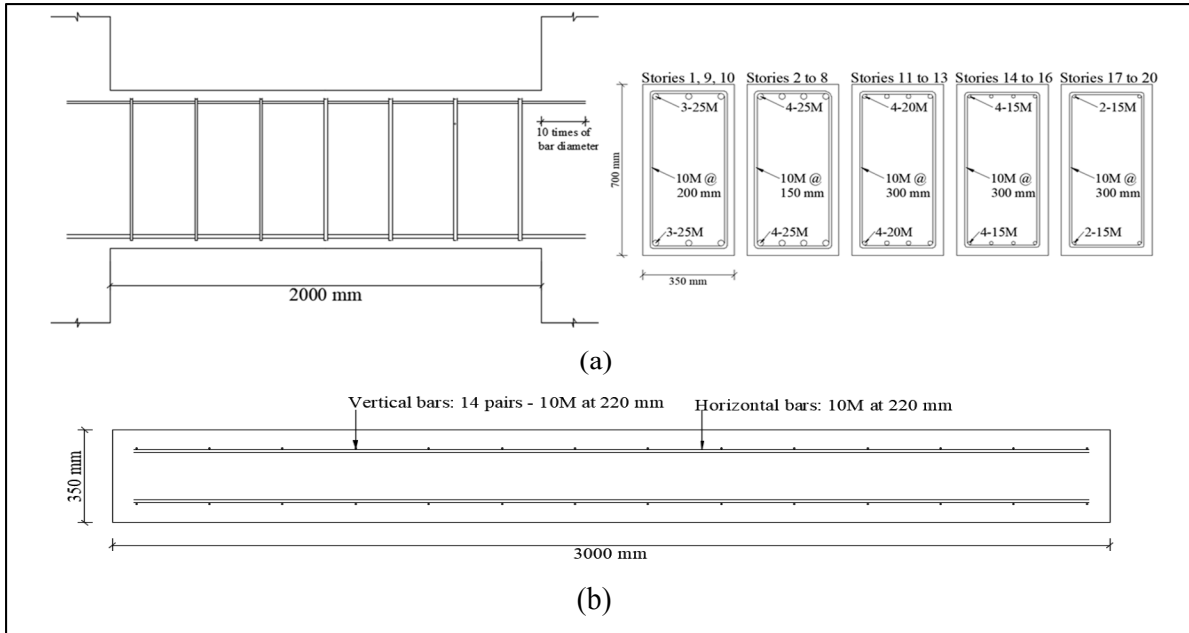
Design summary of CSW1941: (a) Reinforcement details of conventionally reinforced CBs, (b) Reinforcement details of a wall
